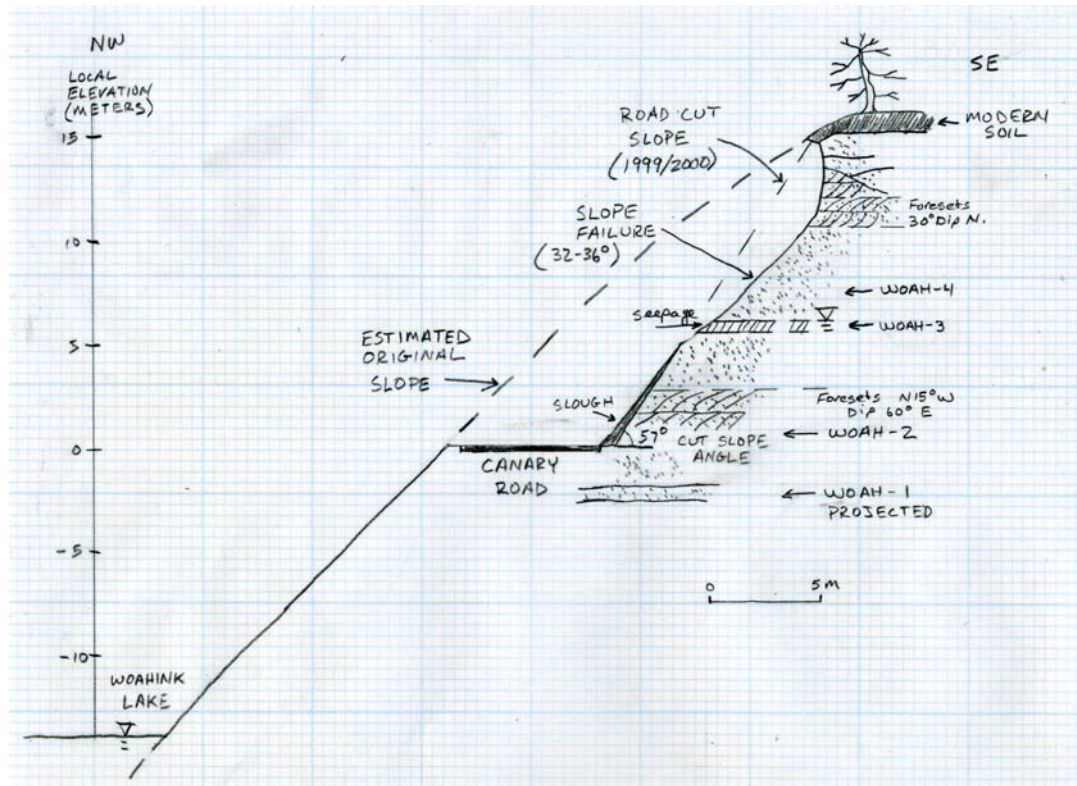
Interpreted dune profile and measured section showing slope originally extended down to interdunal stream cut (Woahink Lake). Four paleodune soils were sampled for geotechnical testing as shown.
